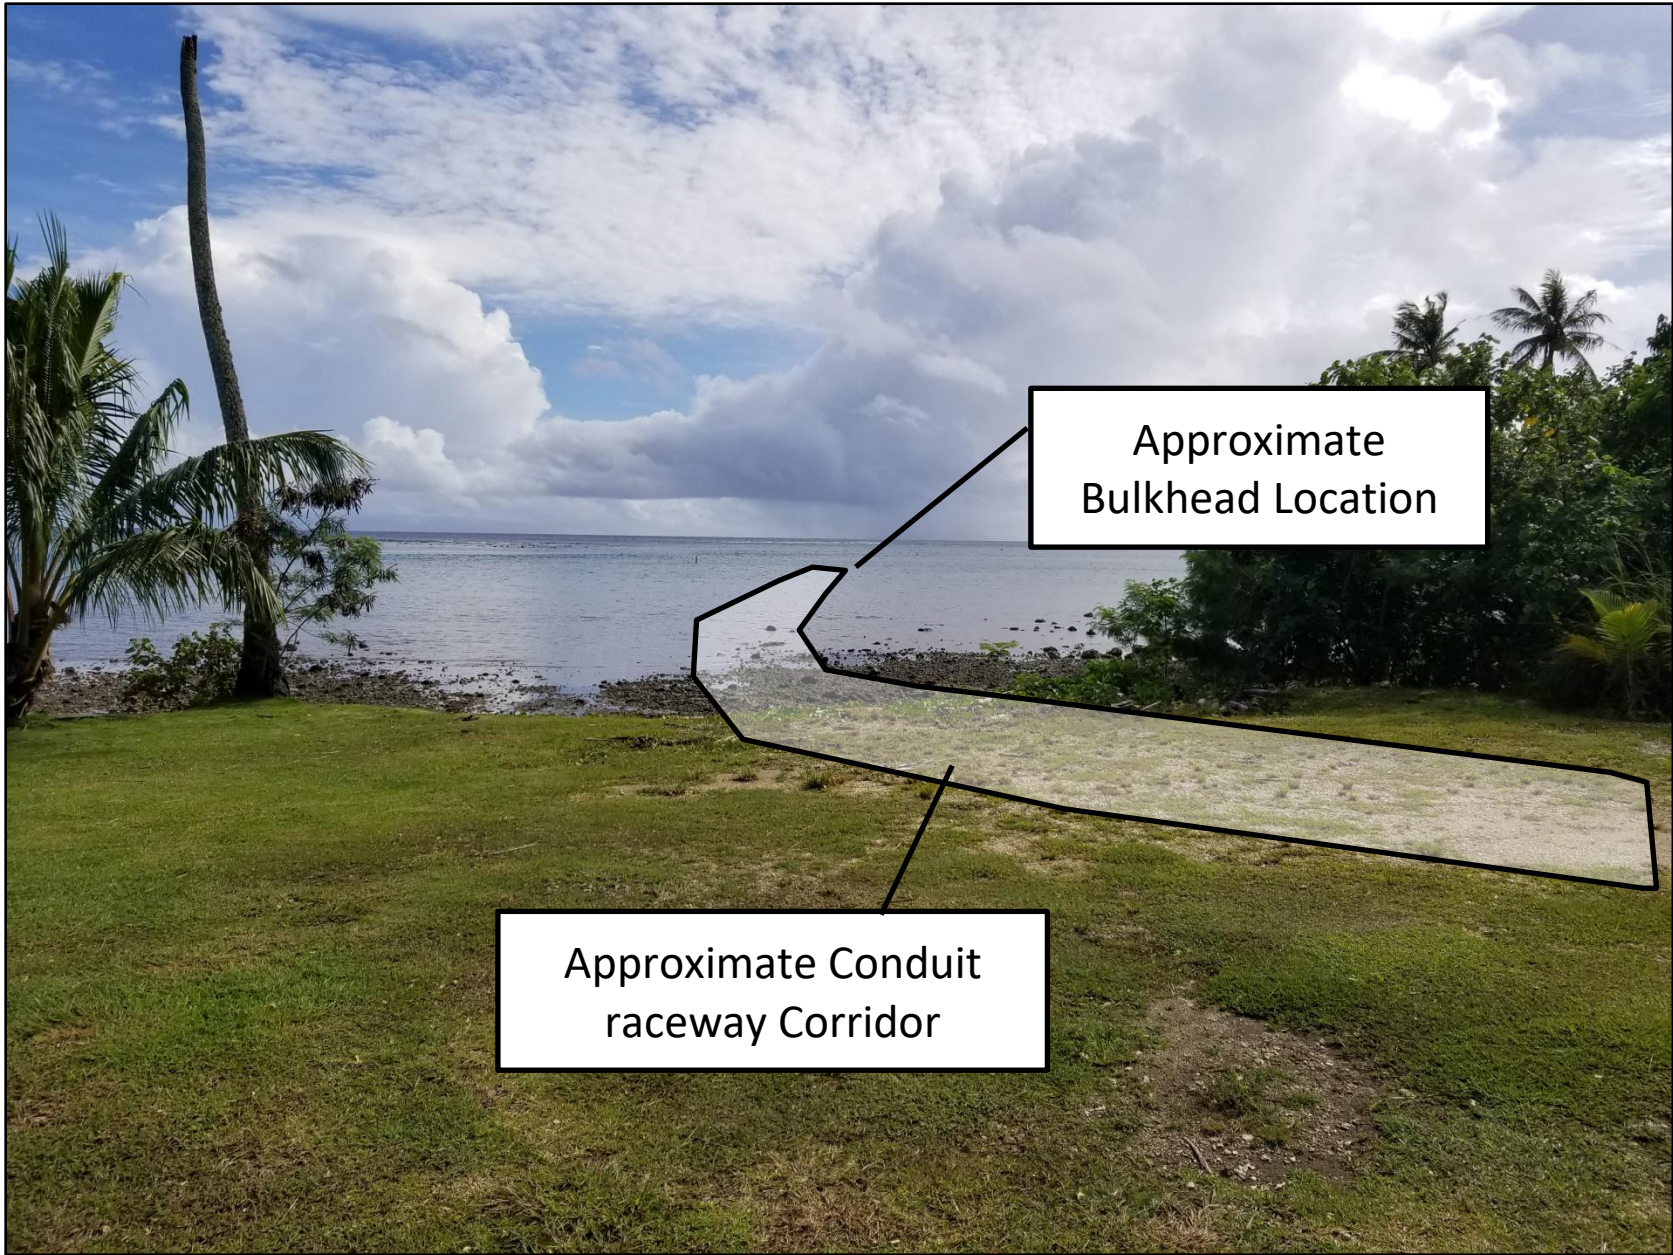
Approximate location of the previously installed conduit raceway corridor and Tepungan Reef Flat, facing north.
